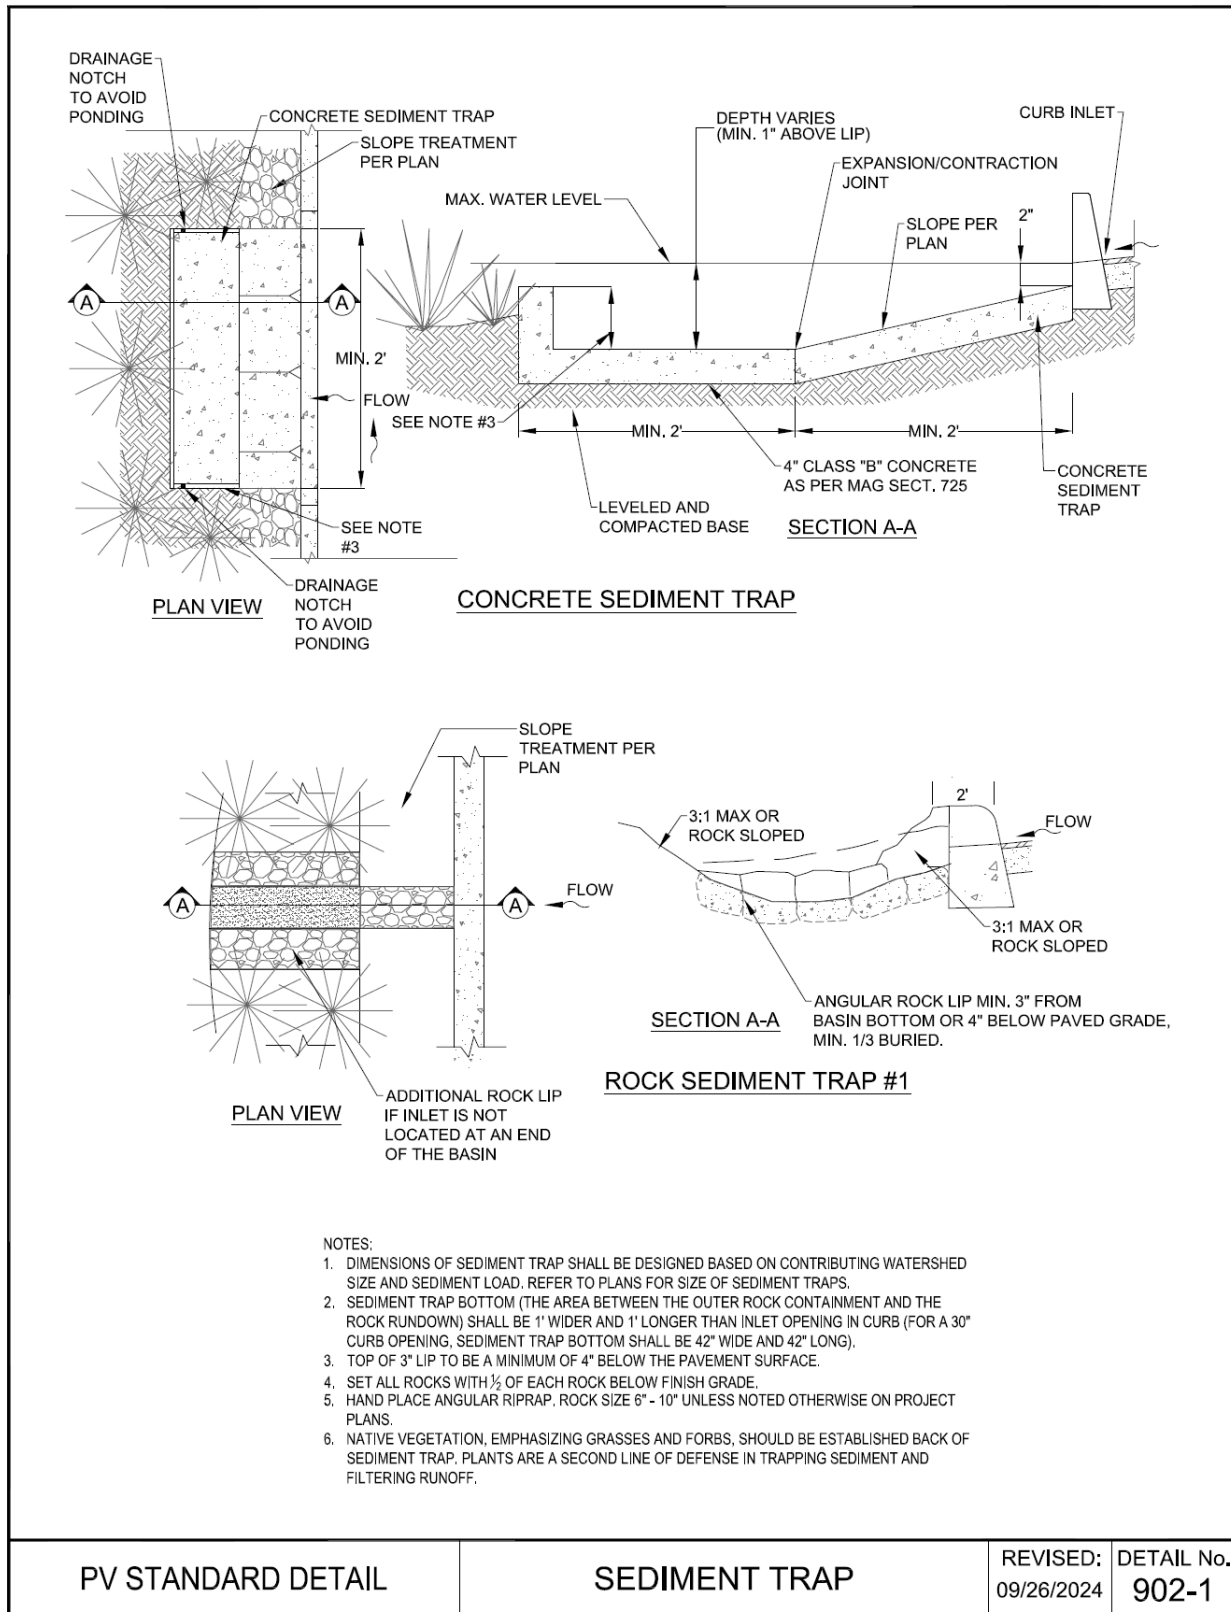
Detail No. 902-1 Rock Sediment Trap
